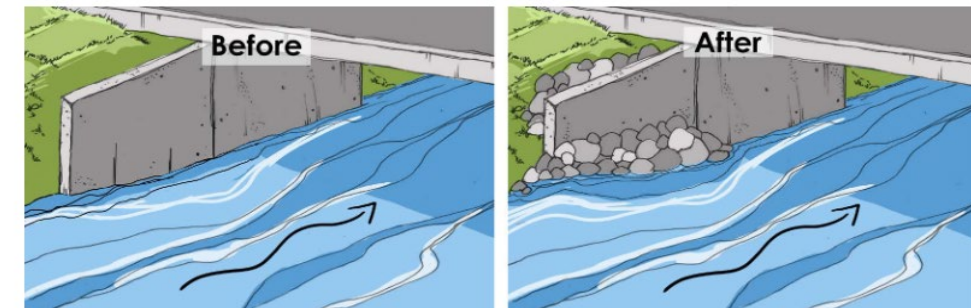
Riprap can protect bridge piers and abutments against erosion and scour.
